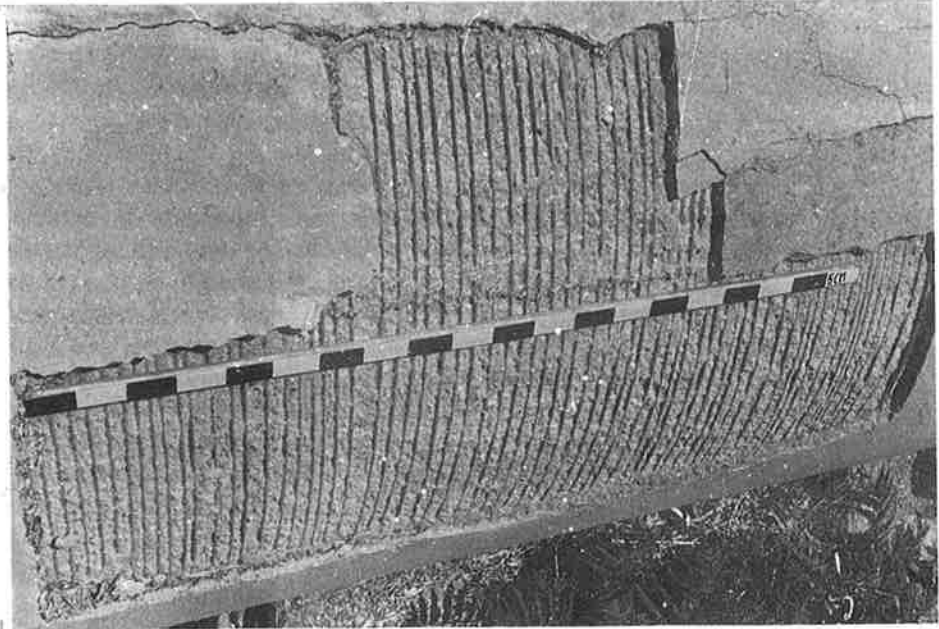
Ban Cheng Zhi Reservoir Prestressed Wire Concrete Pipe Peeling and Corrosion of Steel Mesh Reinforcement.
